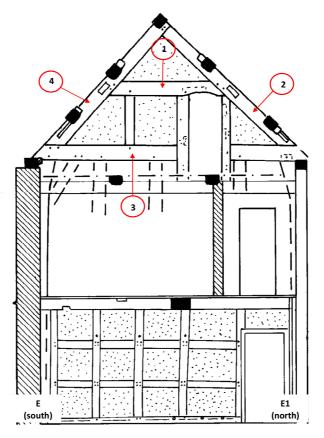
Truss sections showing sample positions (after Faith Cleverdon)
